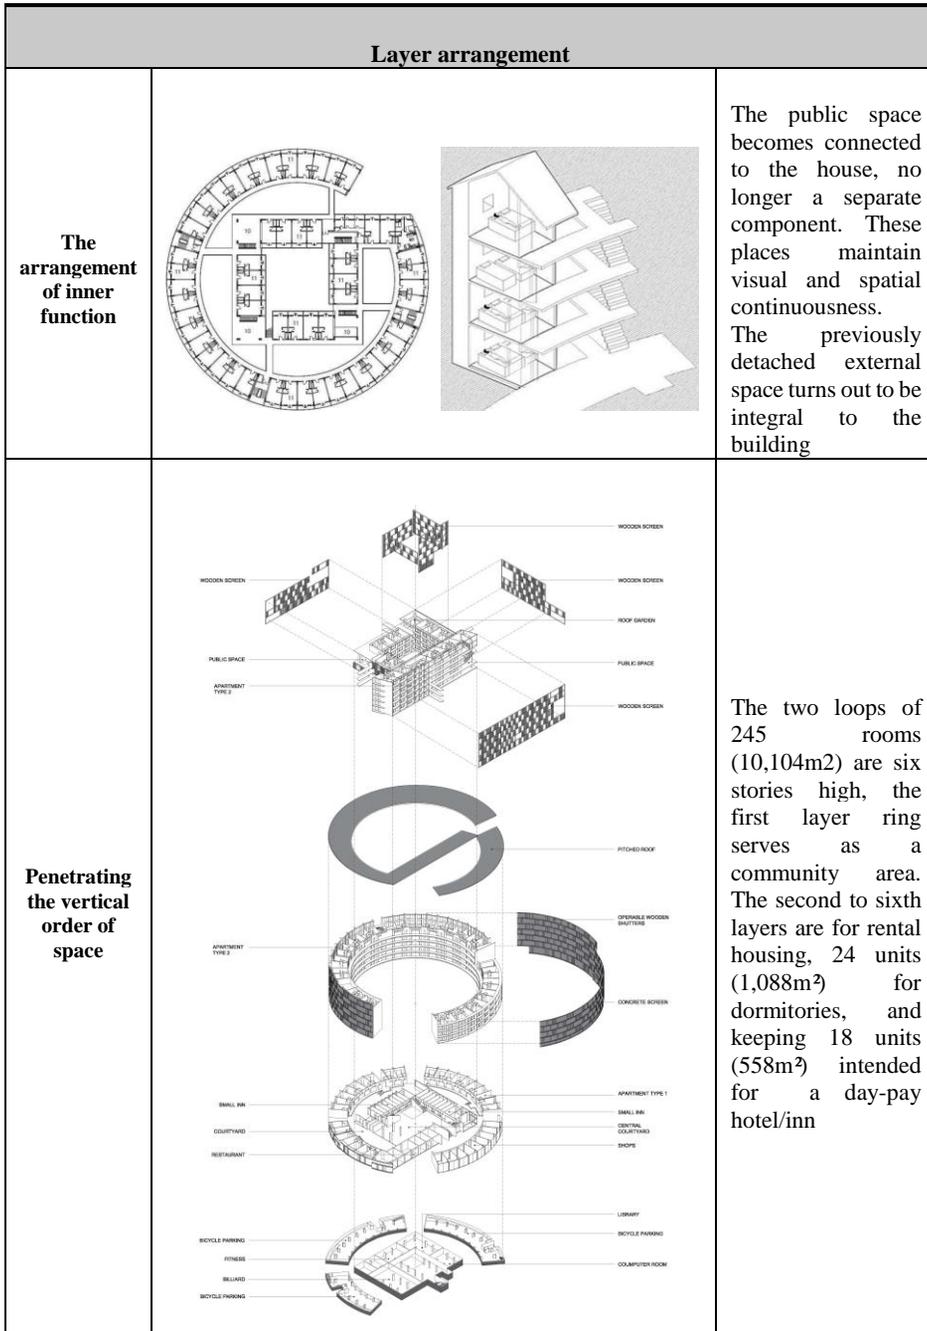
Diagram, plan and section, Traditional *Hakka Tulou* housing structure
